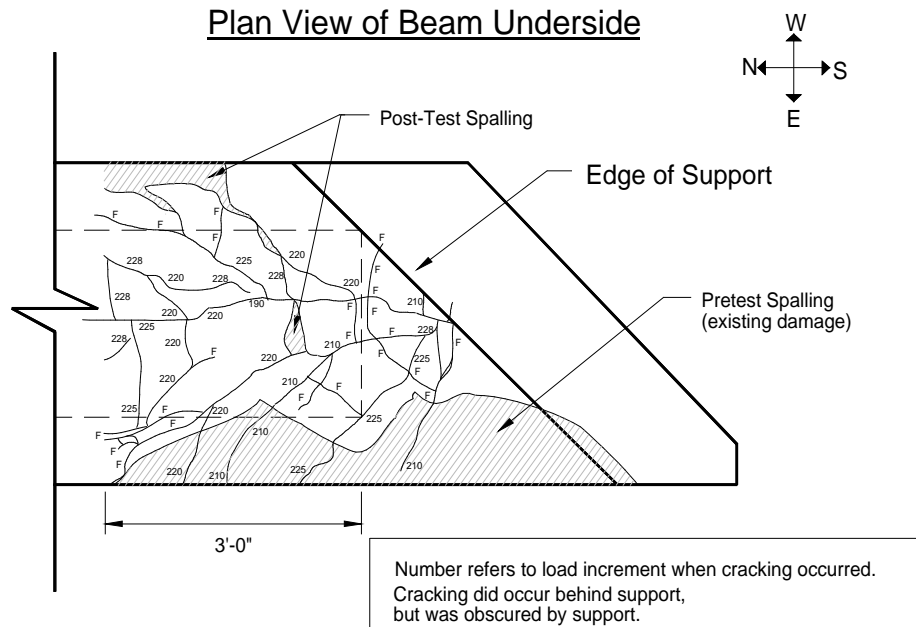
Post-test Cracking in Bottom Flange of Box Beam 5 - Test 2
